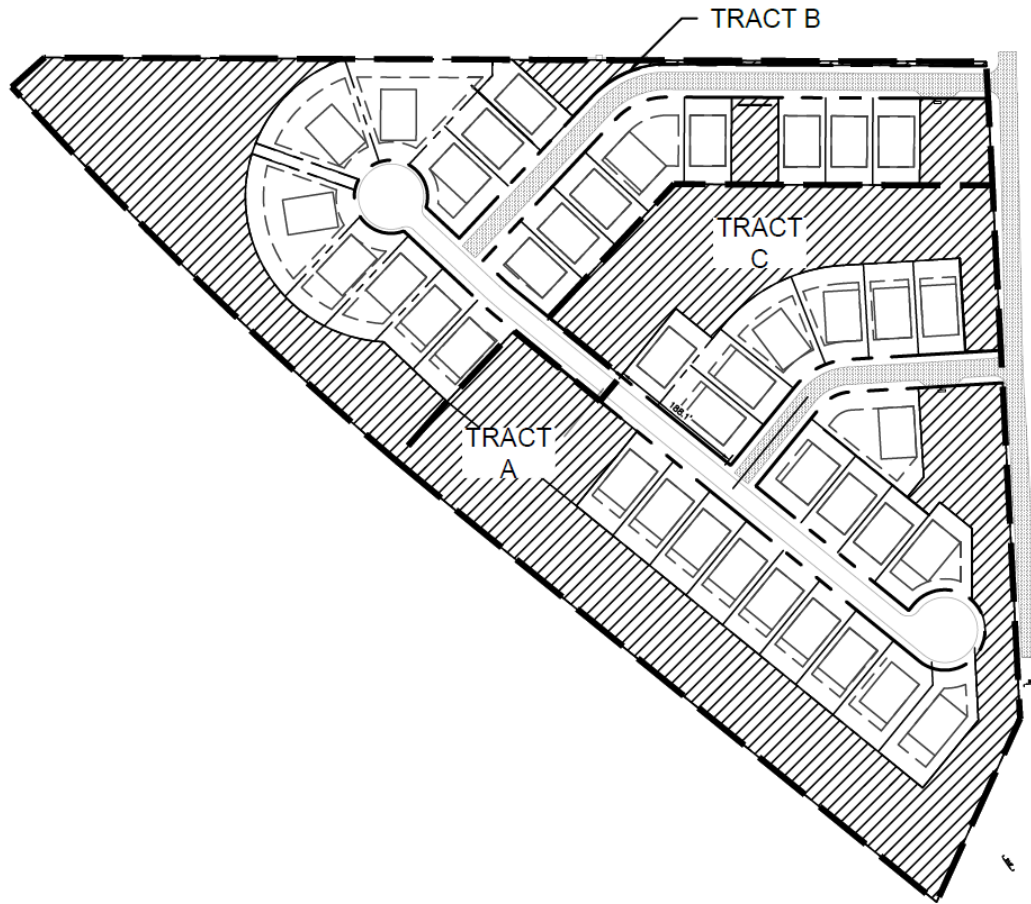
depicts the proposed revised site layout and development phasing. The site will have two access points off Sourdough Road which, with the exception of the first 250± feet, is currently unpaved. This application does not address the existing condition of Sourdough Road, but the current approval includes the requirement for the developer to repair/upgrade Sourdough Road to City standards for the full length along the eastern boundary of Lot 2.
